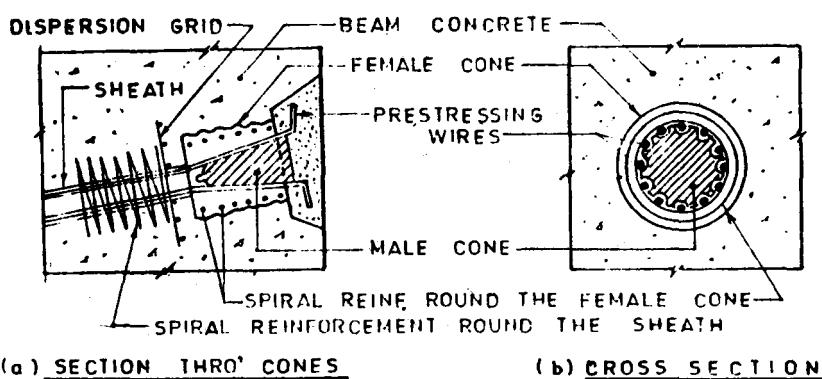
·2 ANCHORAGE FOR FREYSSINET SYSTEM
